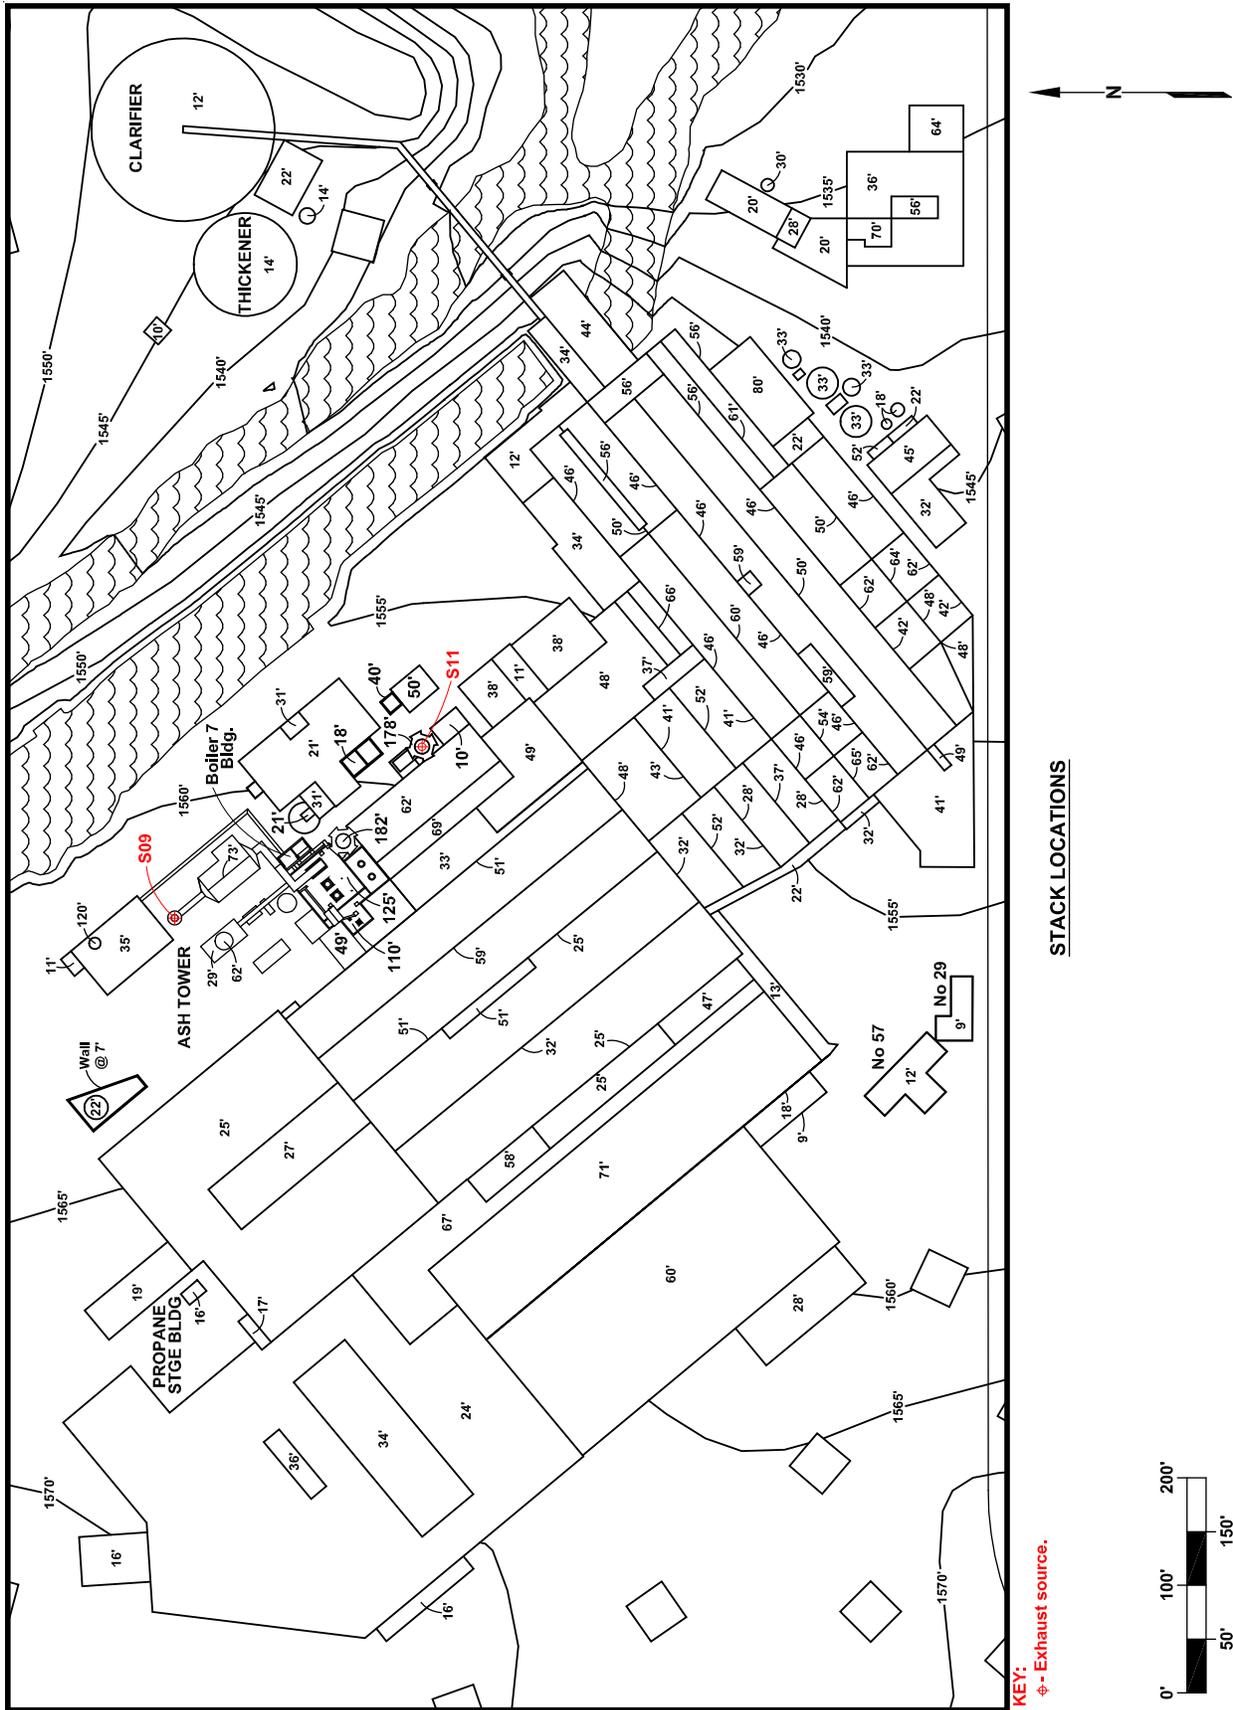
Close-up plan view of buildings and stacks, all building in configuration.
